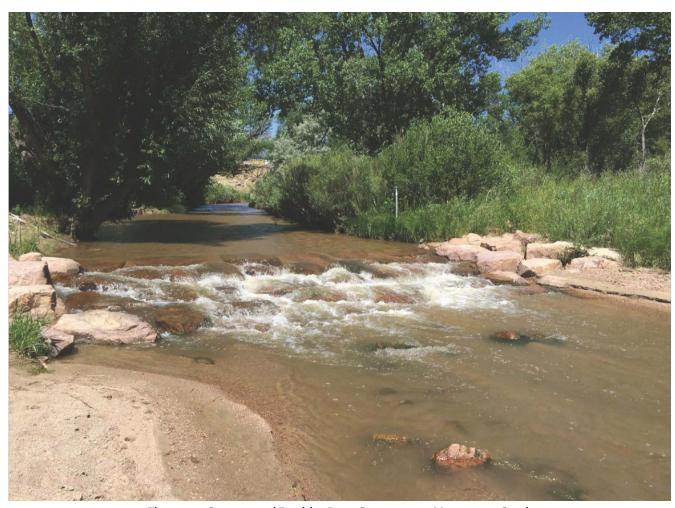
Constructed Boulder Drop Structure on Monument Creek
